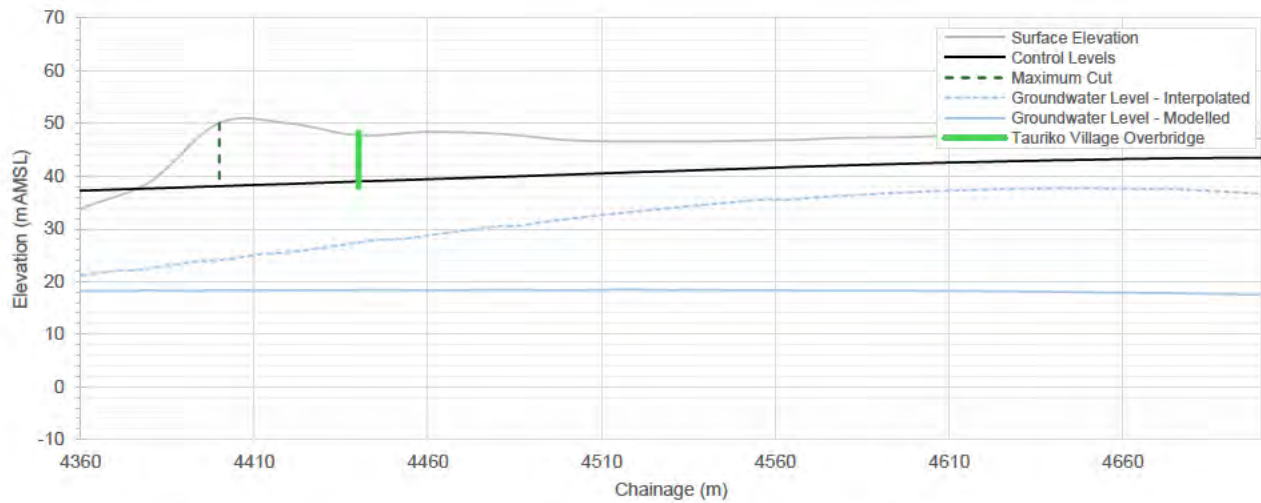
Long section along 4360 to 4700 m (SH29_Cut 5 and Tauriko Village Overbridge).
